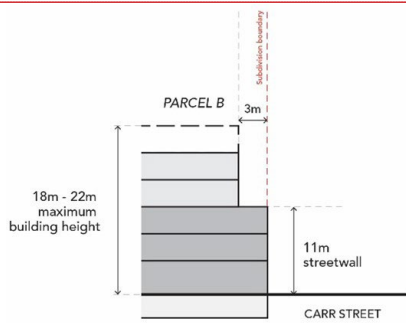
Parcel B fronting Lonsdale Street and Carr Street
